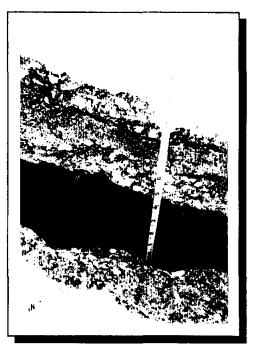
Soil Loss Behind Sideslope Pavement Slab
